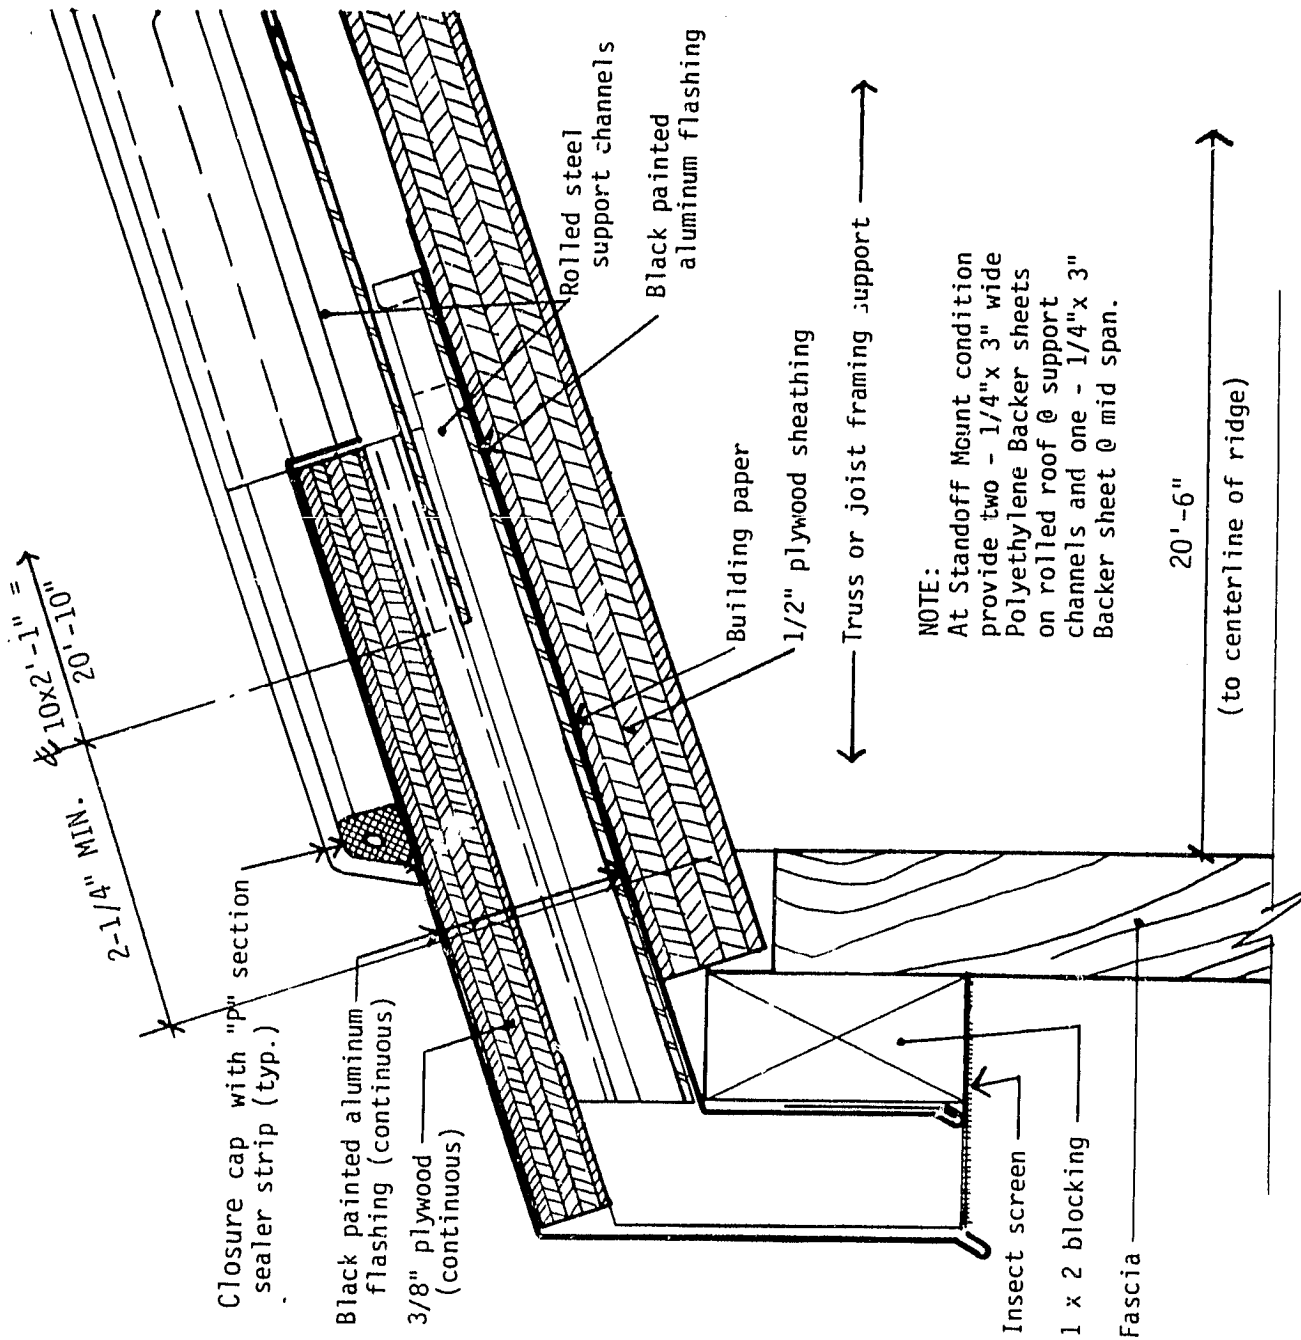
Eave Detail at Support Channel (Direct Mount)
